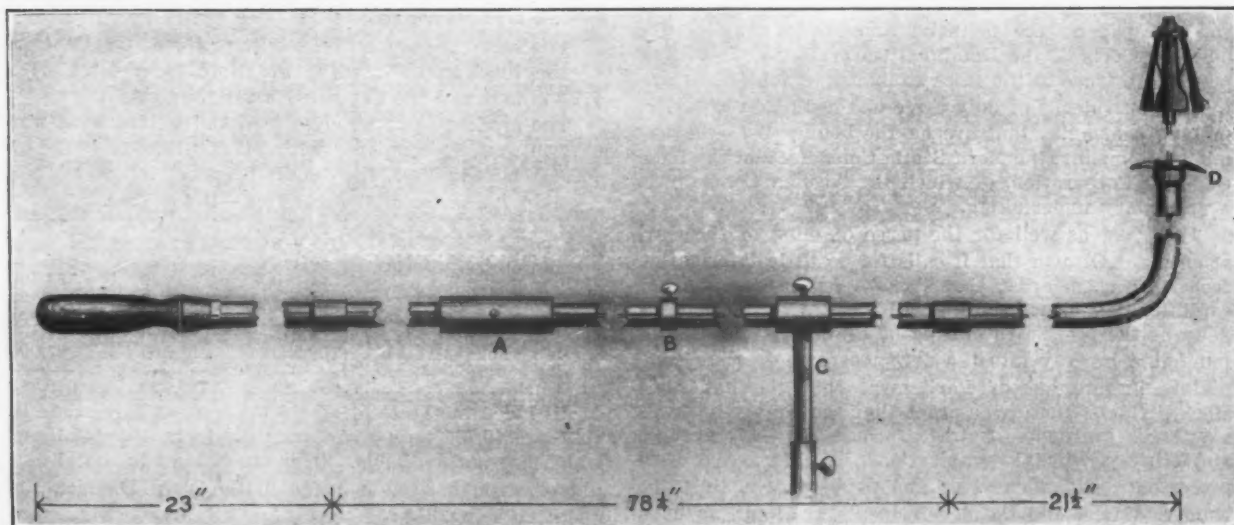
An Interrupted Compressed View of the Clark Boiler Flue Cleaner.
